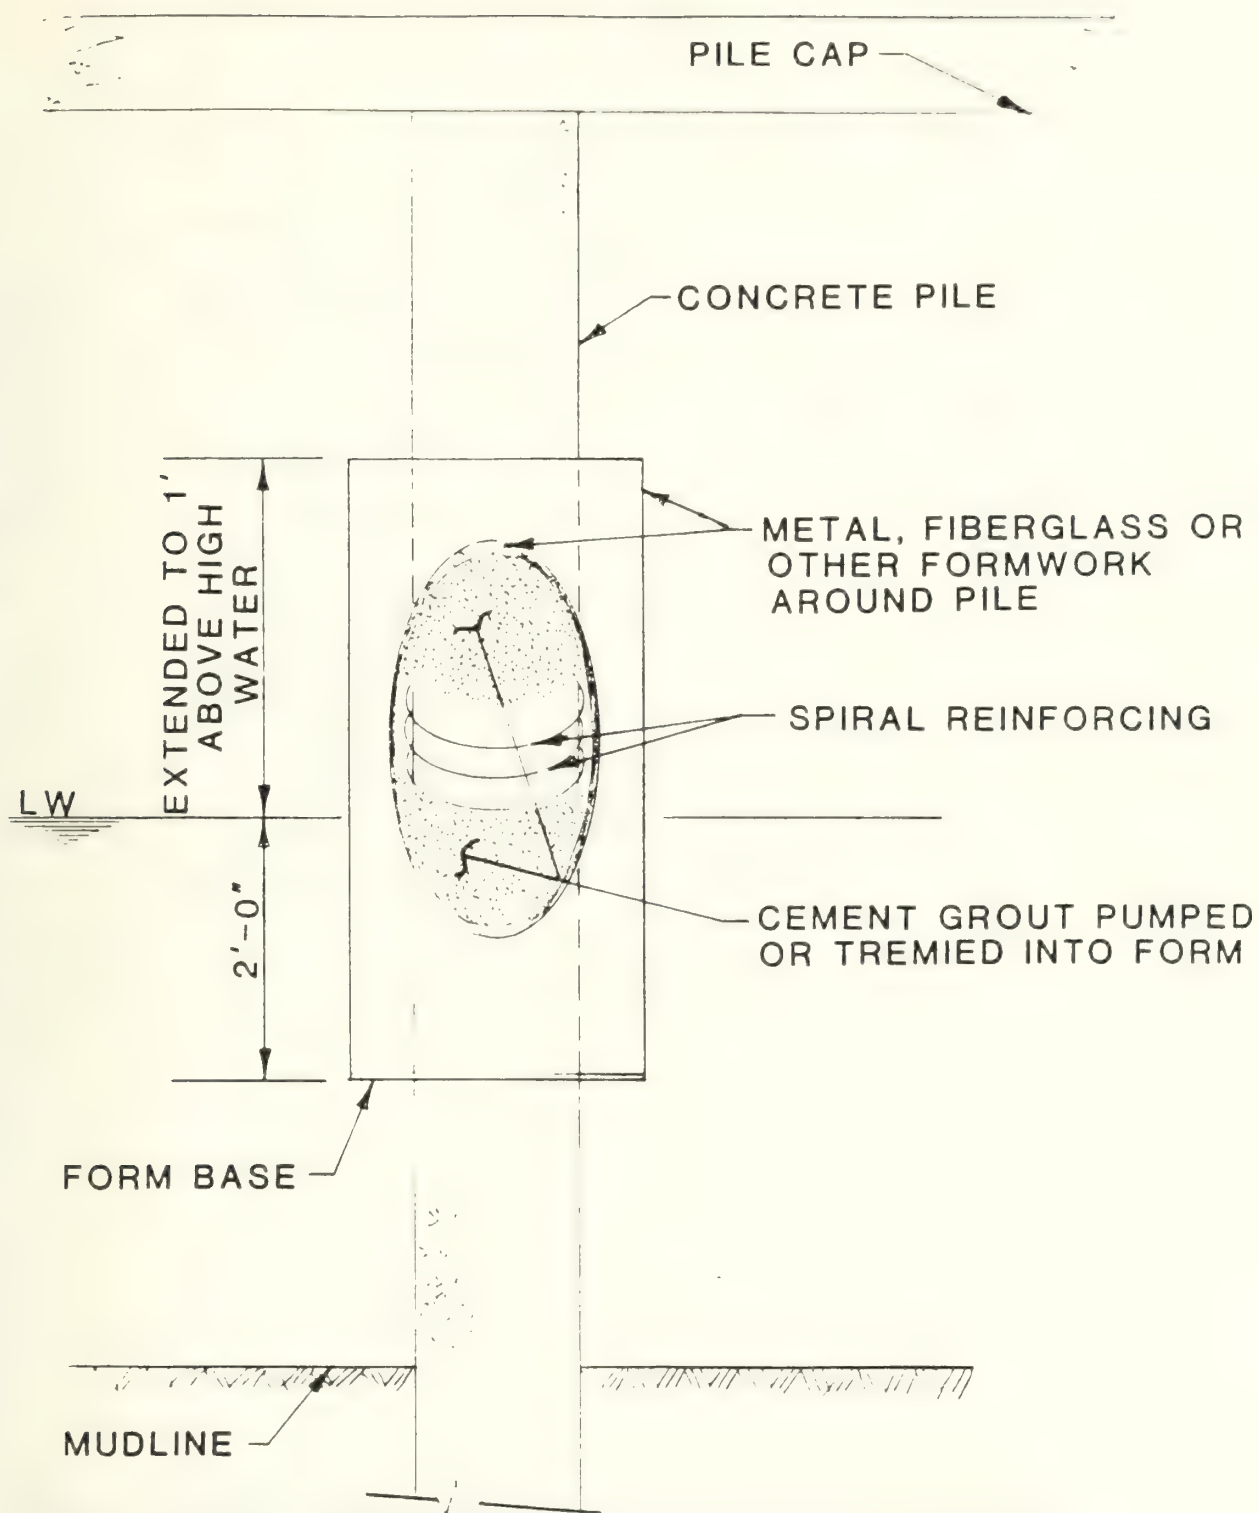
Typical View of Concrete Encasement Method [26]
